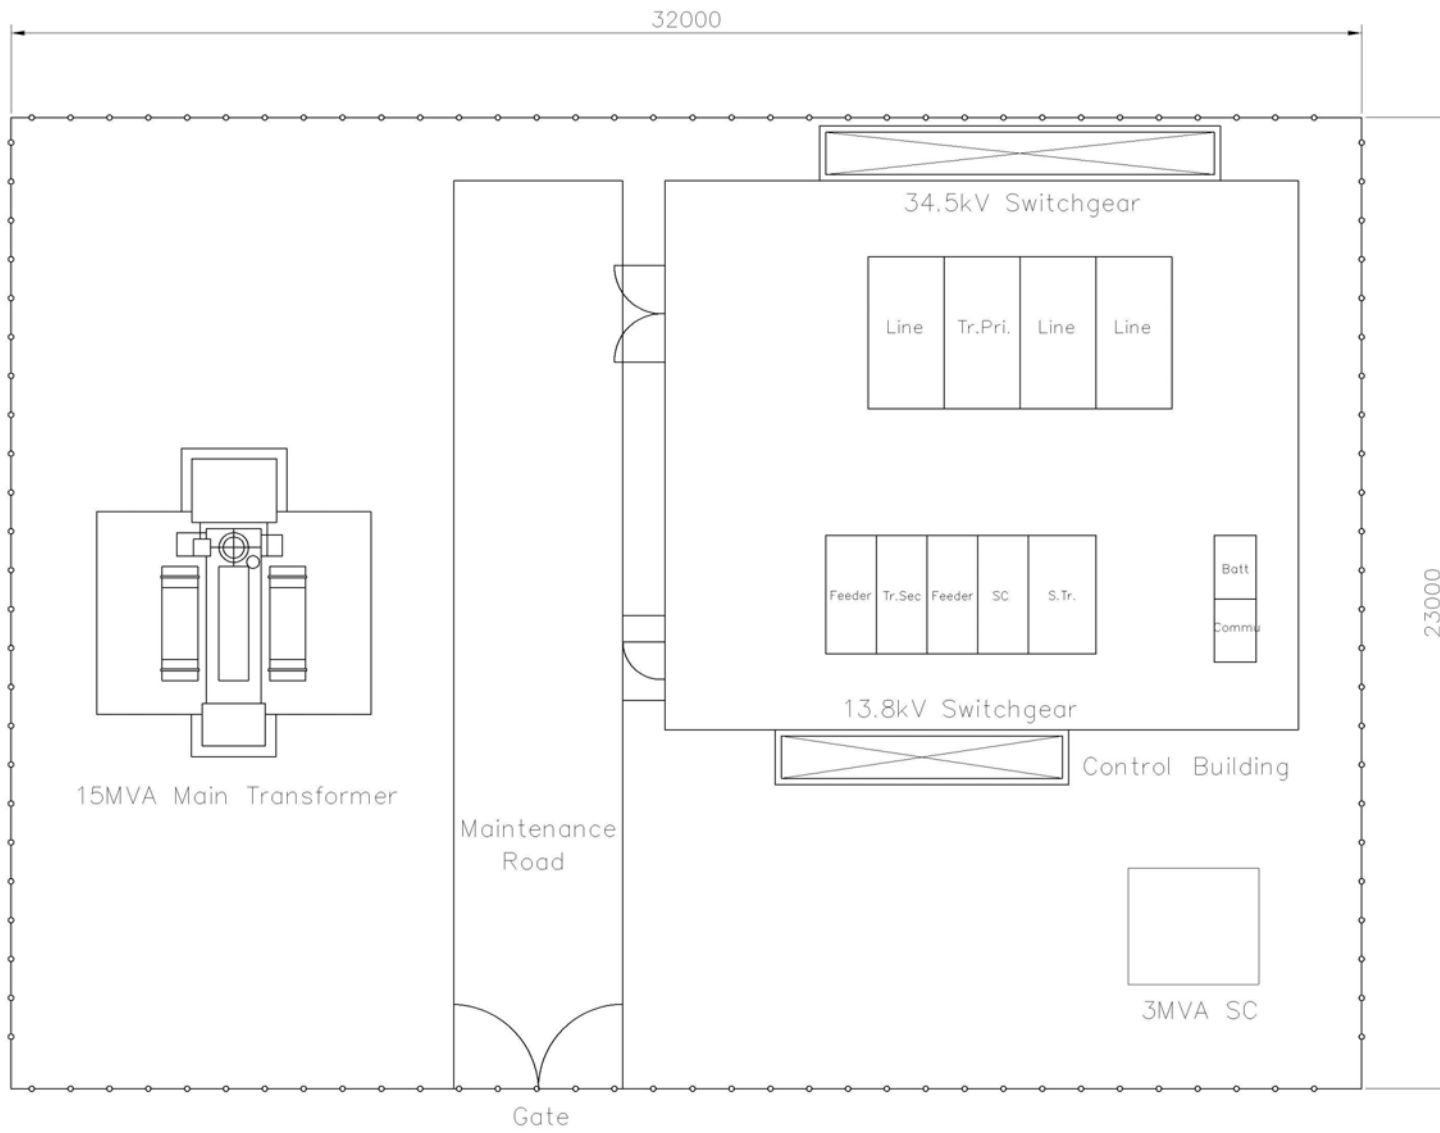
Koror substation Equipment Layout Plan
